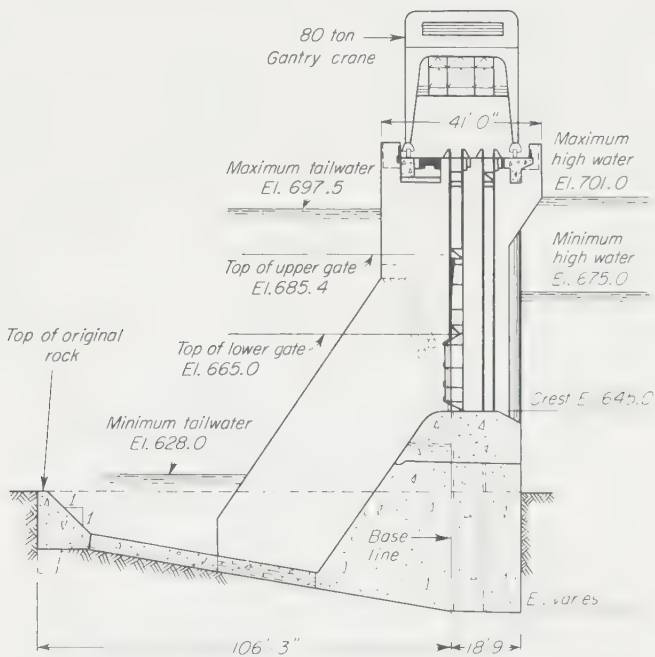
Section through spillway at Chickamauga Dam, TVA.
